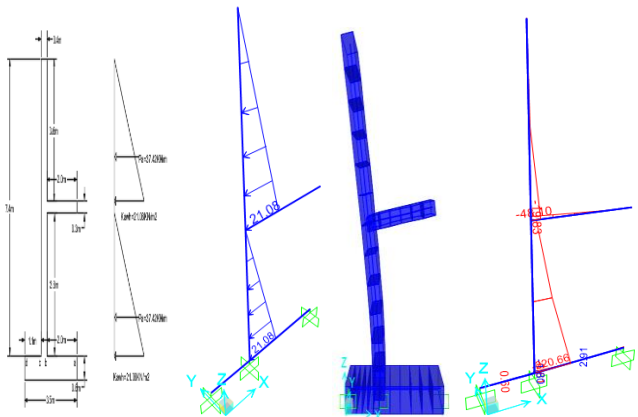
Deflection and BMD diagram of 8m high retaining wall with single shelf.
